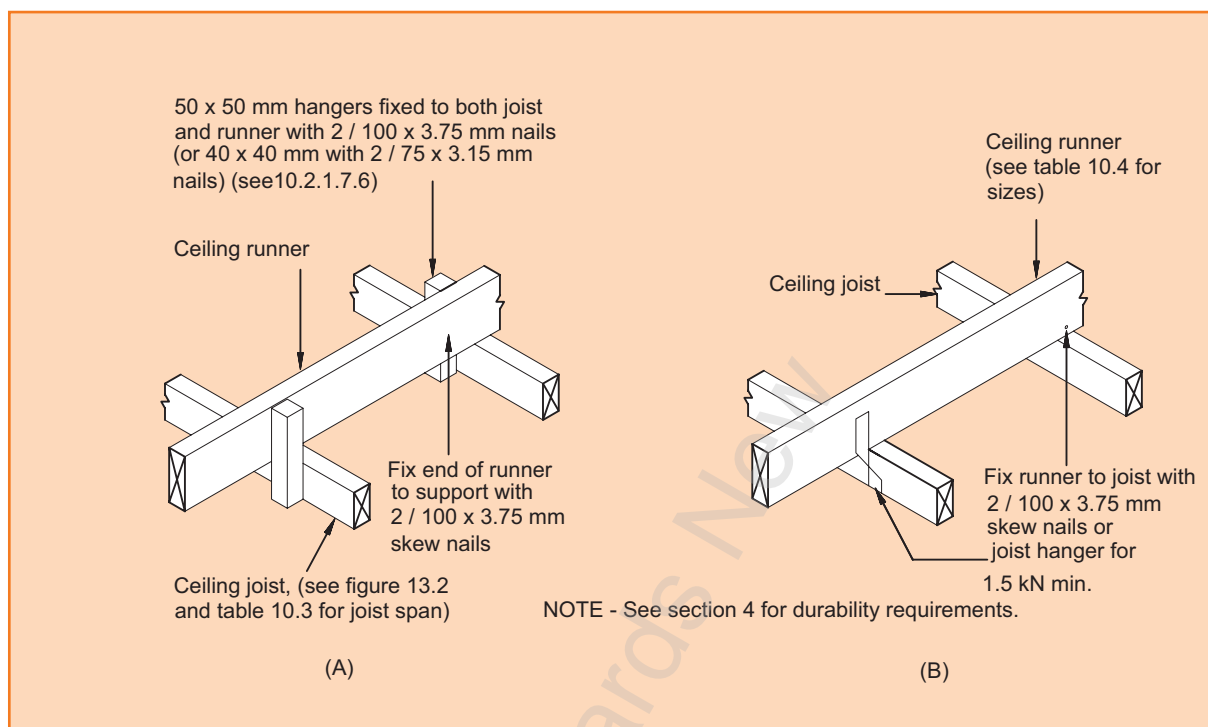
Ceiling runners (see 10.2.1.7.6)
